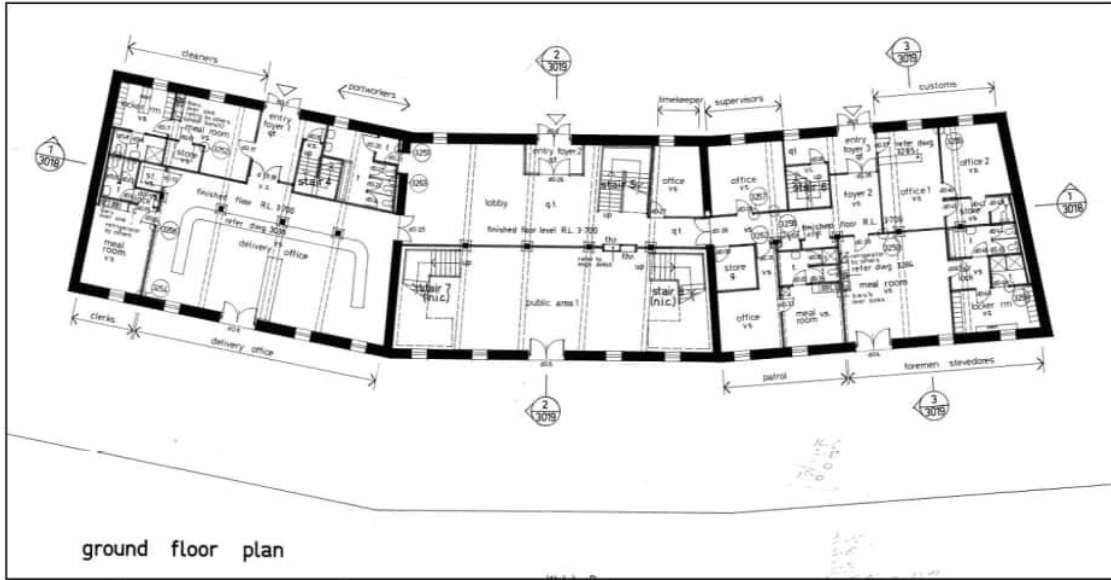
Extract of 1980 plan displaying the ground floor plan of the Moore’s Wharf building after relocation (Source: Historical plans provided by GroupGSA)
